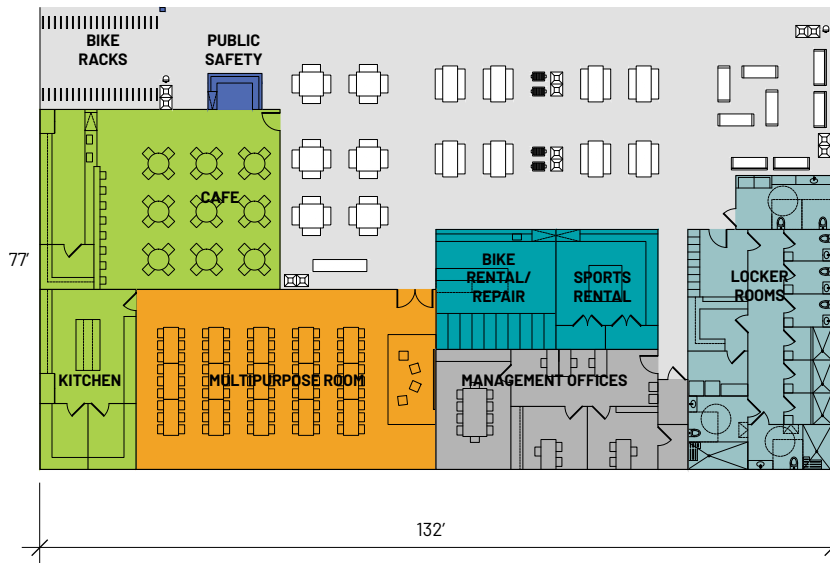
The plan of the Gathering Pavilion (Tier III) example at river mile 28.4 shows how multiple facilities can be incorporated onto a project site.
